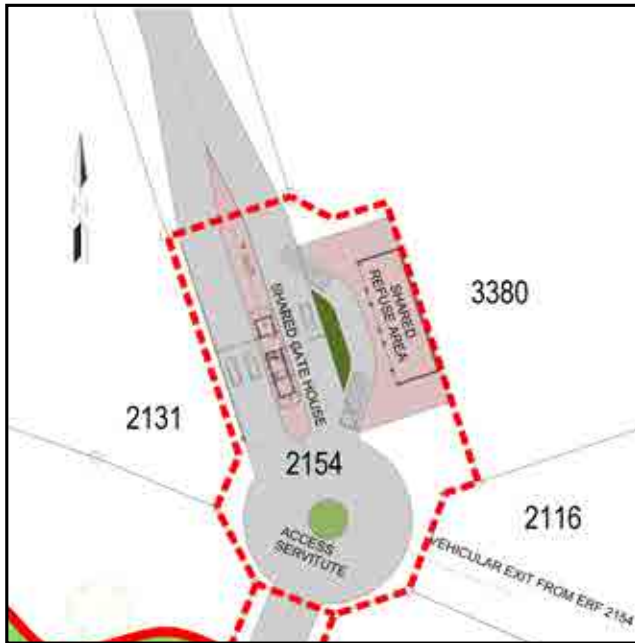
depicts the locality of the Refuse Room bordering Erf 3380, which common boundary building is applied to be relaxed to 0metres in lieu of 5 metres.
